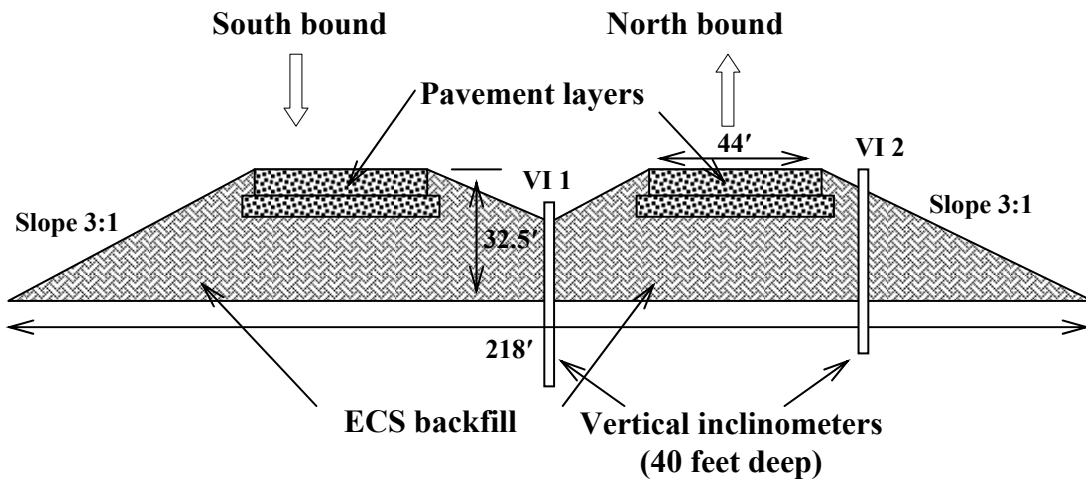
Typical Cross Section of ECS Backfilled Approach Embankment, SH 360, Arlington, Texas
